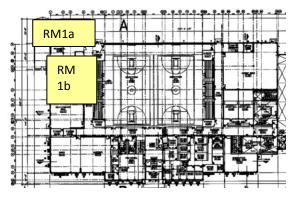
Rec Center 1st Floor Mechanical Room Locations
